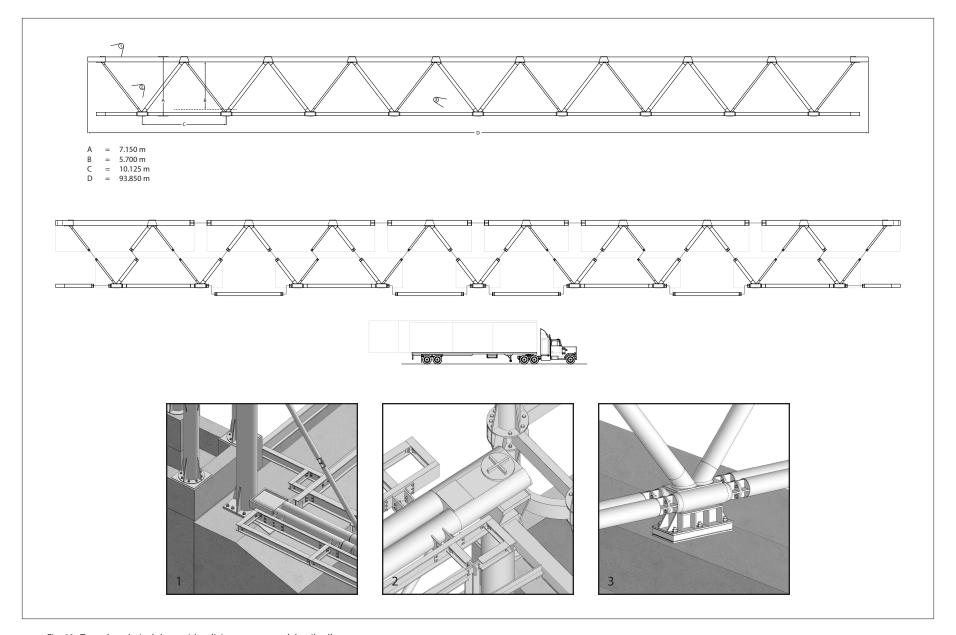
Truss-A, technical sheet with splicing strategy and detail callouts
